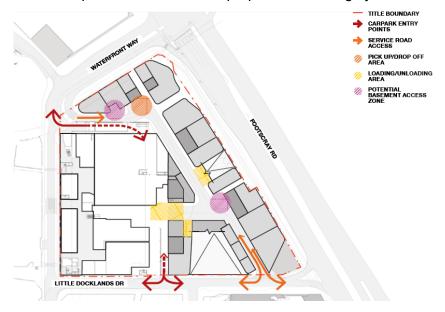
DP Addednum Movement and Parking Plan 8 extract
